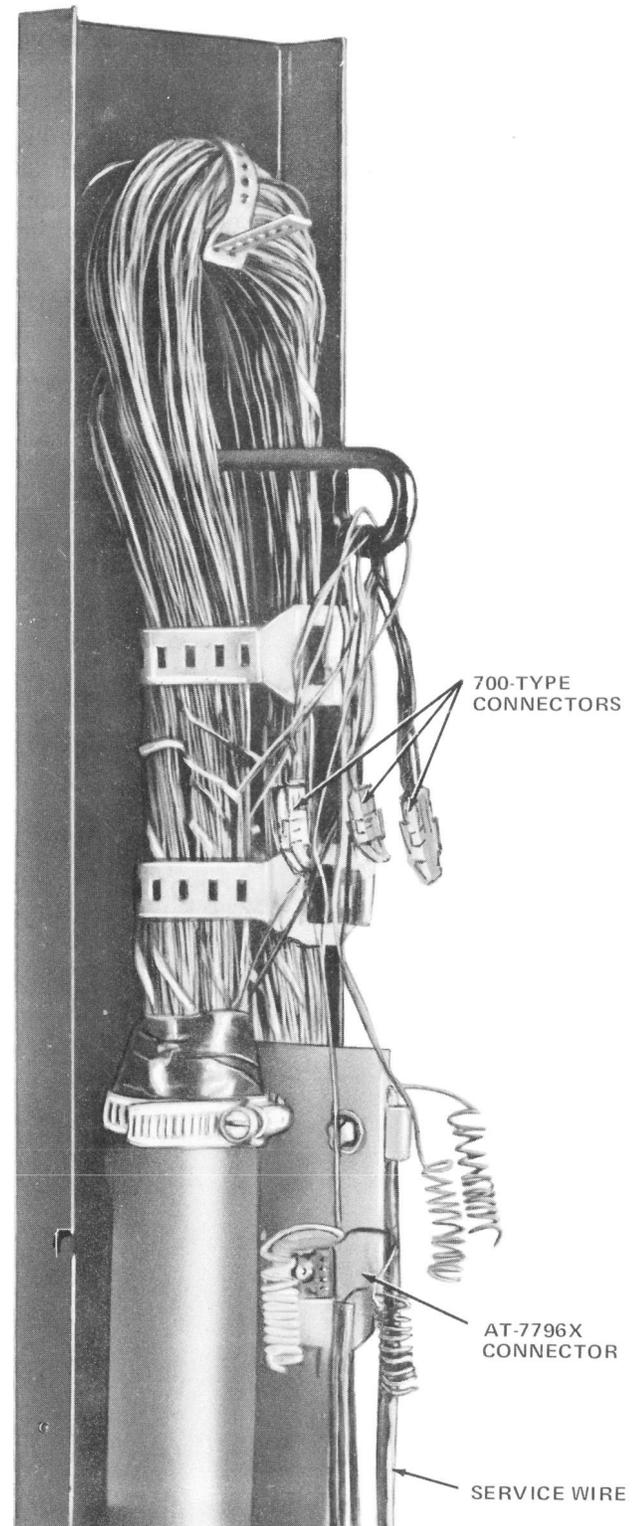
Service Wire Installed—UP-200 Cable Closure
